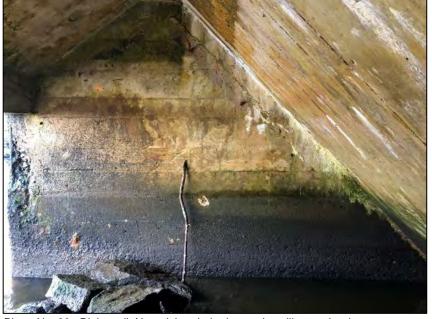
Right wall. Note debonded rebar and spalling on the downstream end.
